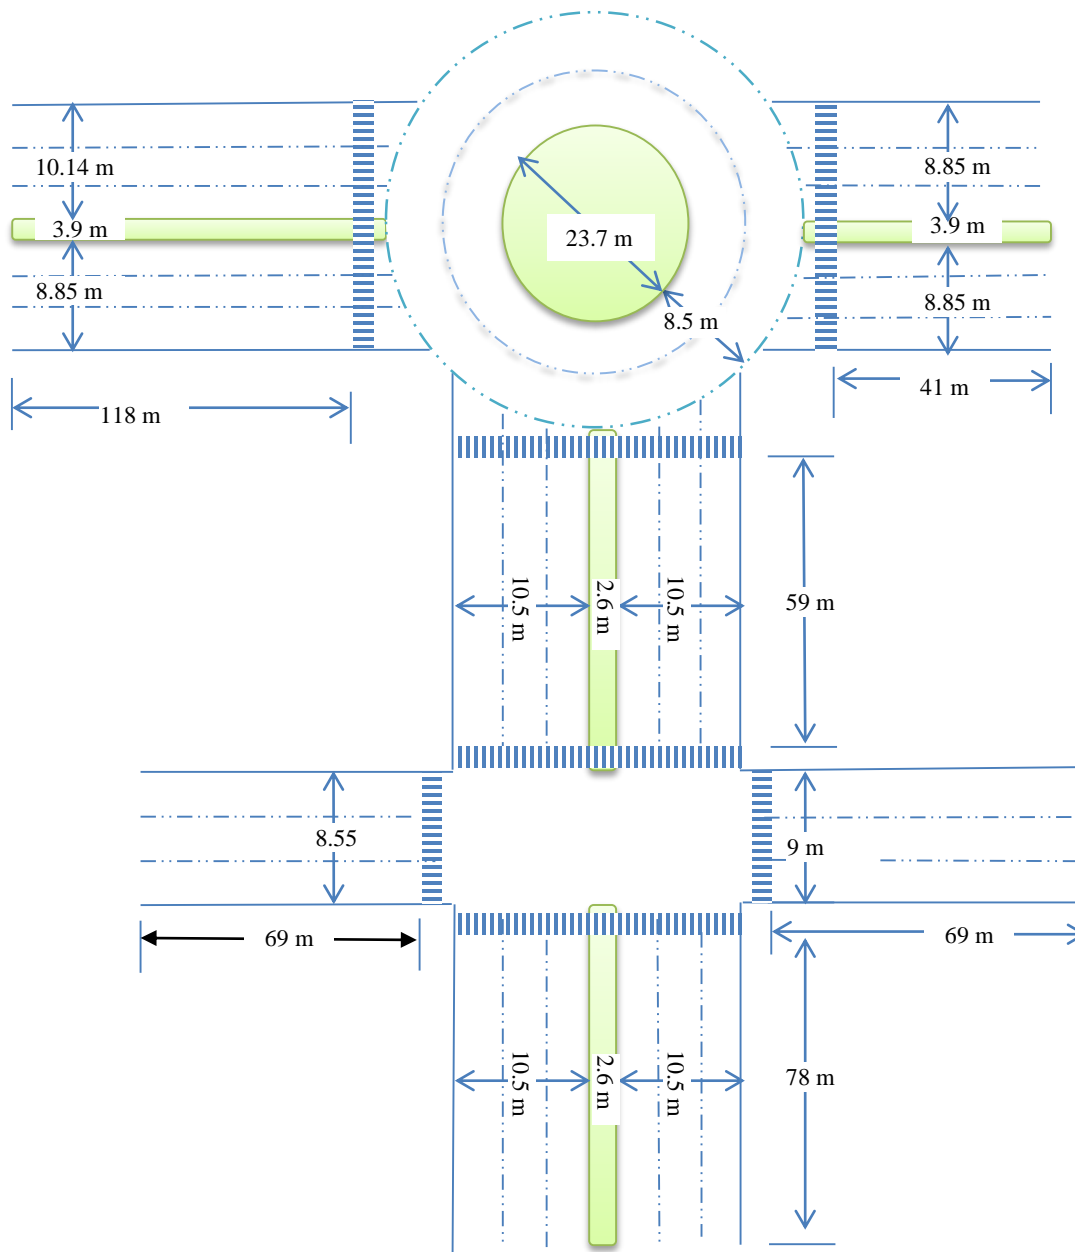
Giorgis roundabout and intersection at Zmamnesh building
